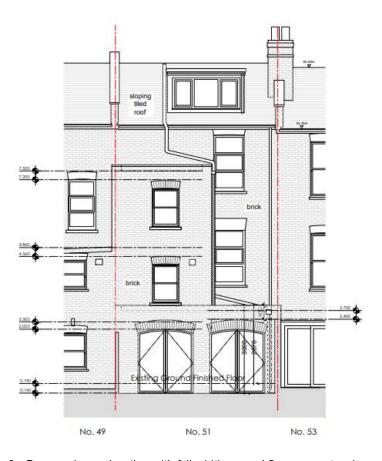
Proposed rear elevation with full-width ground floor rear extension extending 1.0m and additional storey on top of outrigger extension
